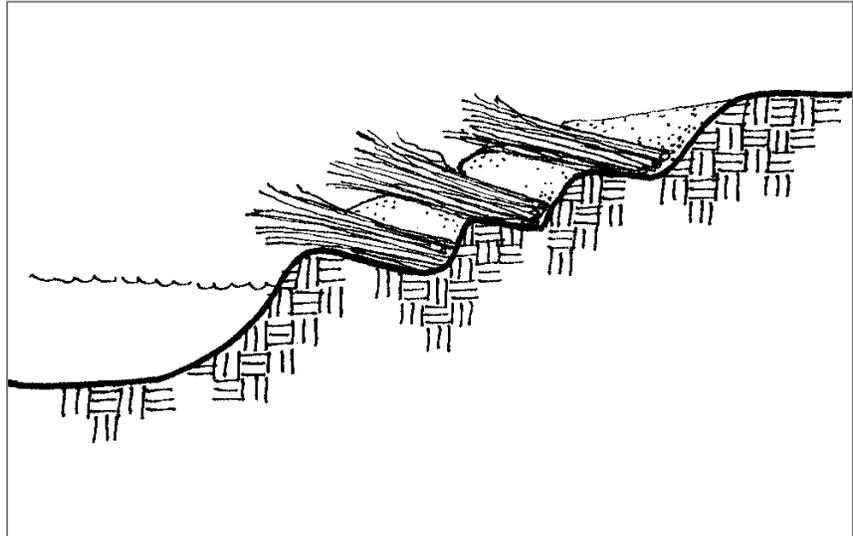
Brush Layering (Source: Bentrup, 1998)
